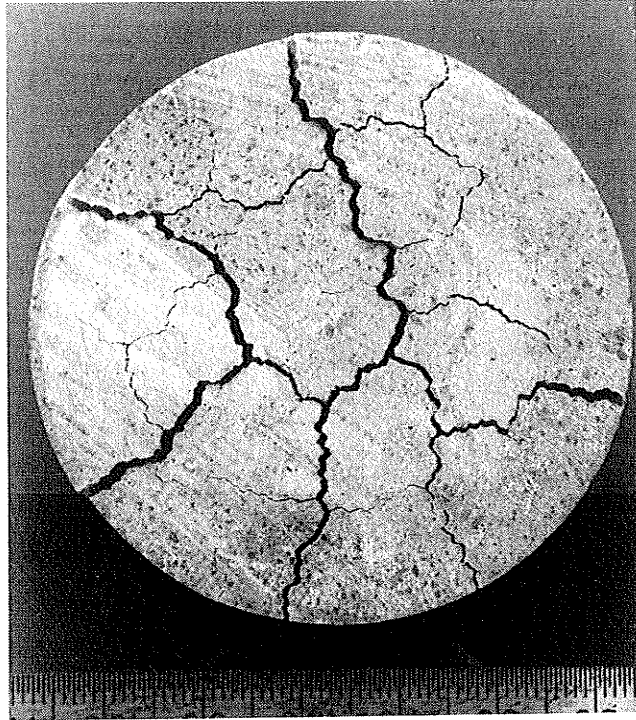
Cross-section of cracked specimen at end of test (Mix B specimen)
